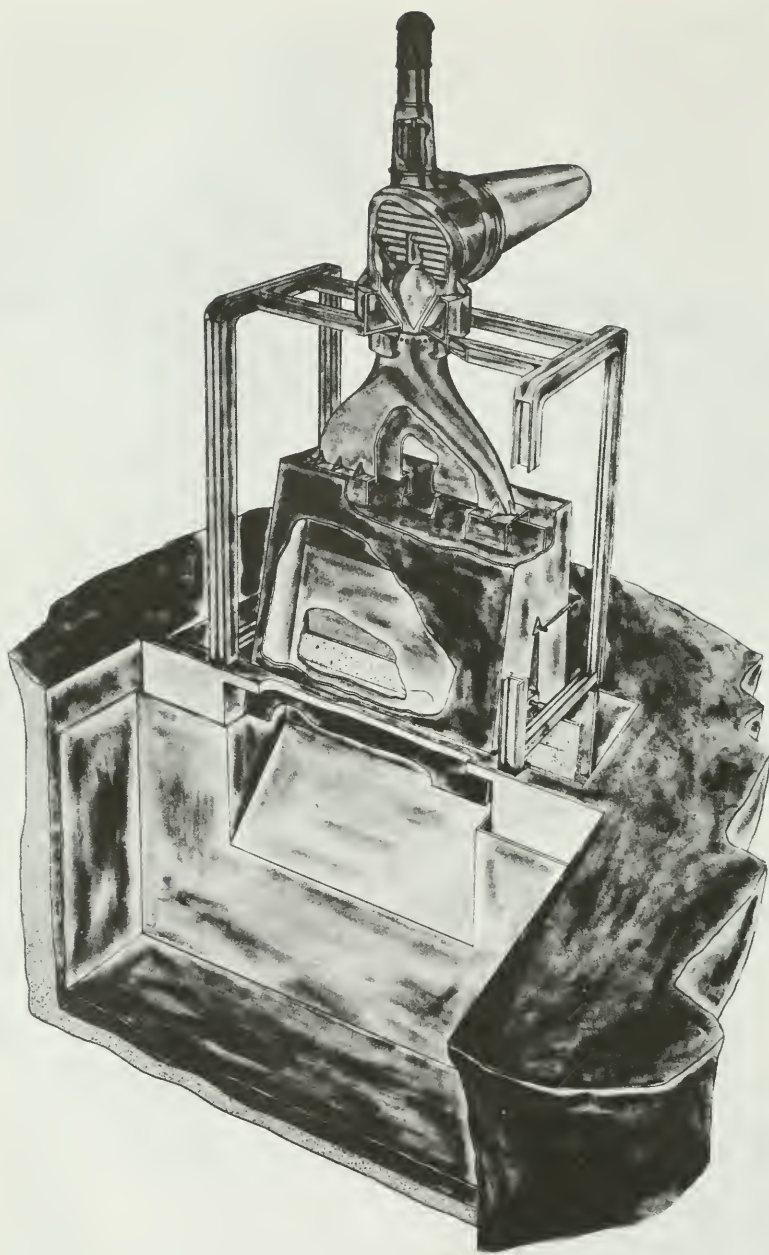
SPEAR VALVE - No 3 BREAKDOWN VALVE AND DIVERTER
